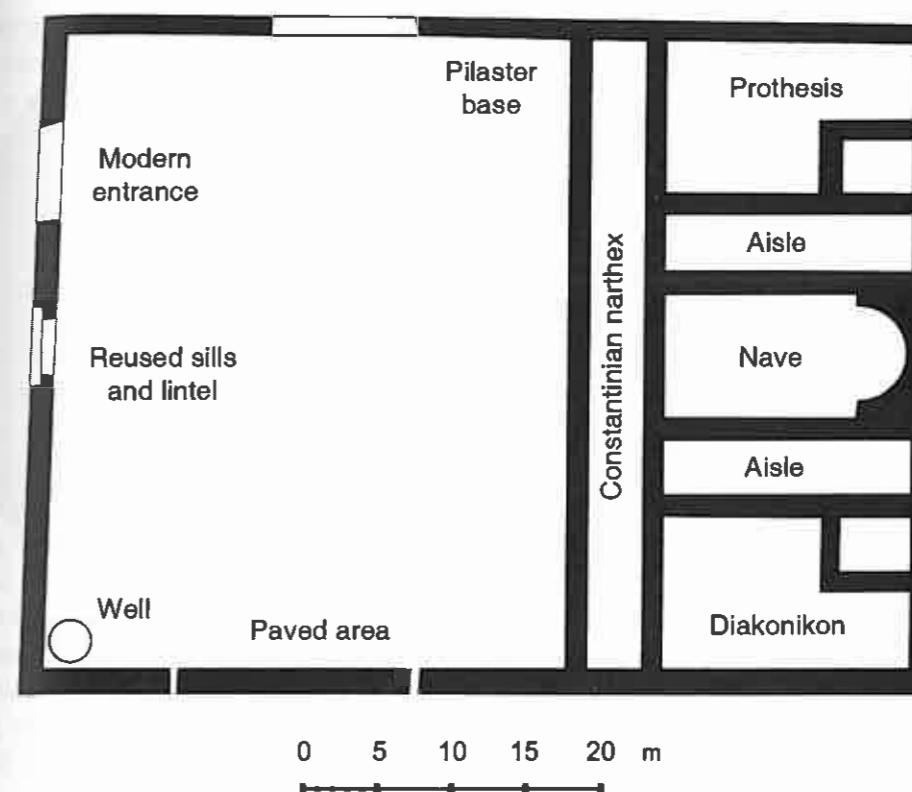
Church at Mamre. Plan. A. Tayfun Öner.
